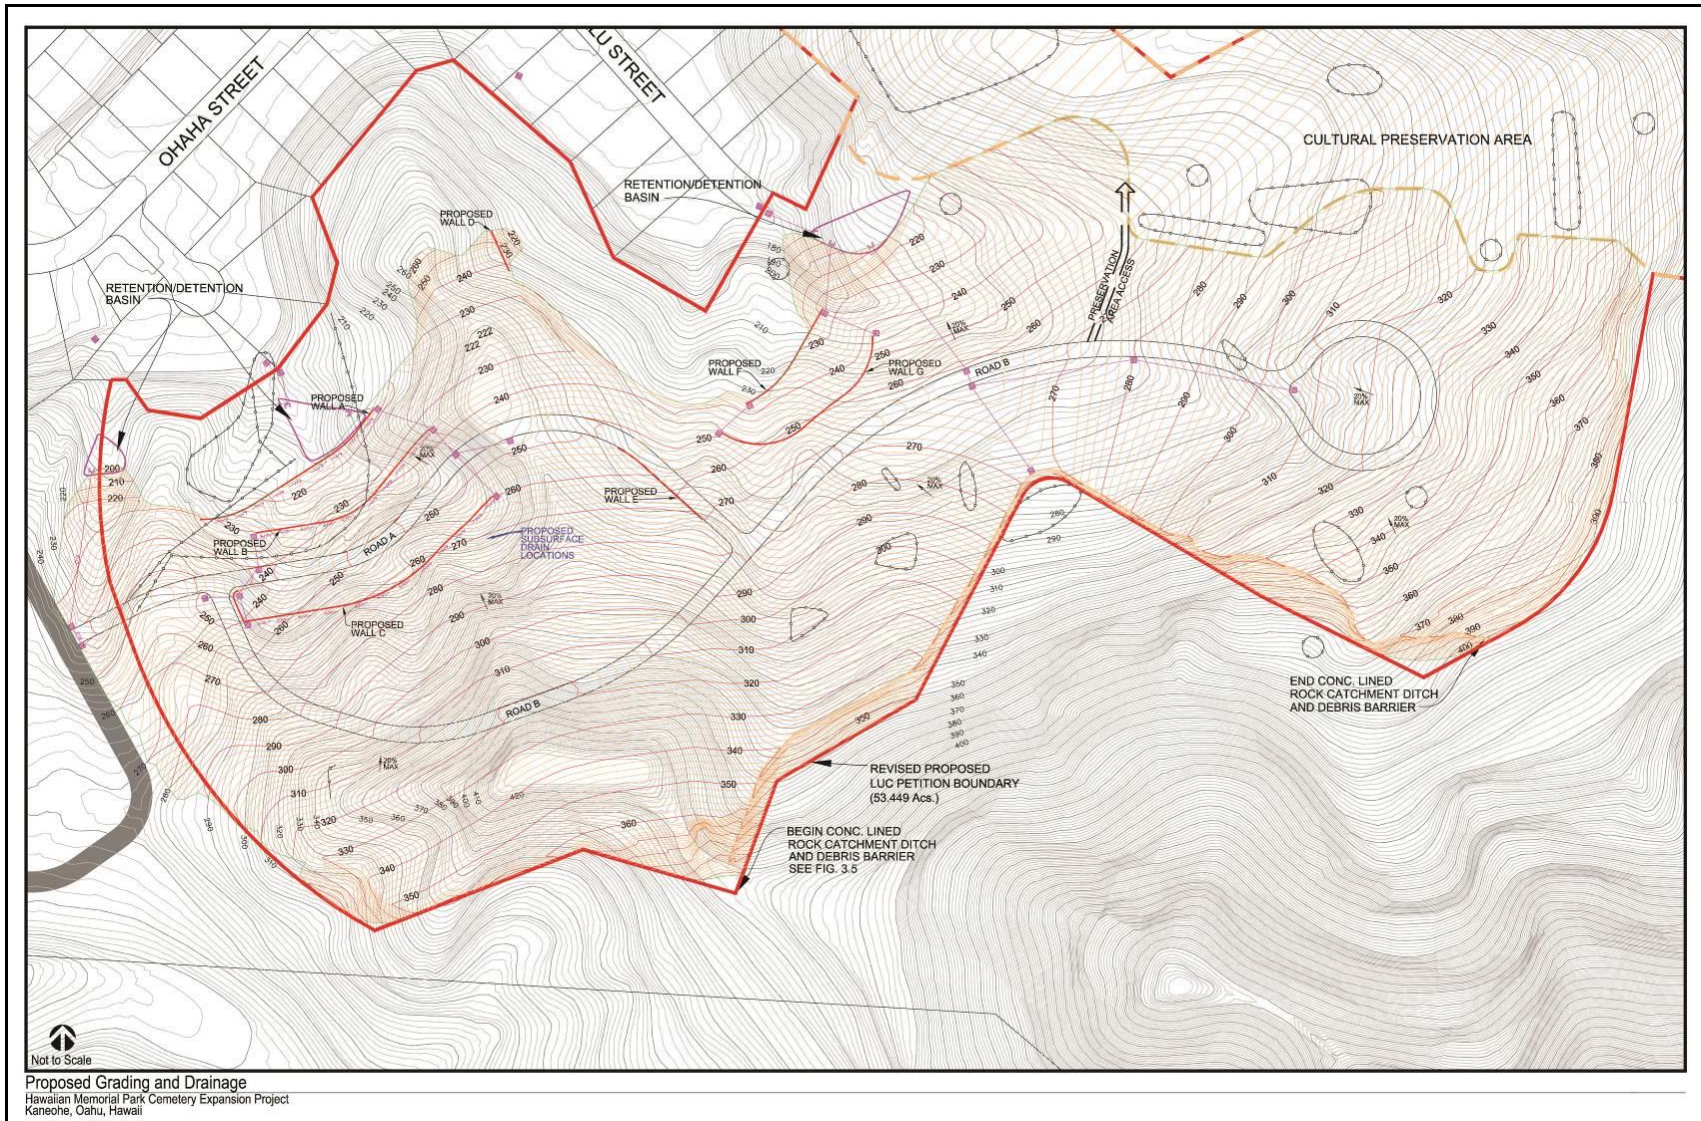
2018 Proposed Grading Plan (HHF Planners 2018)
